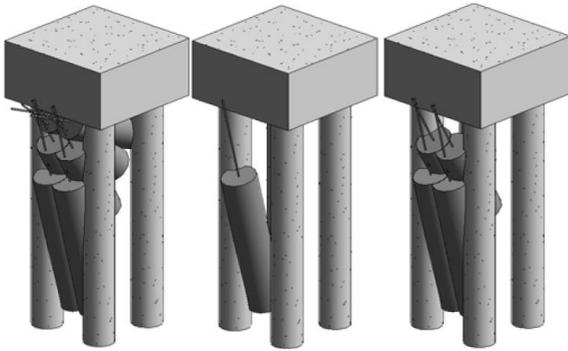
Indicative grouting stages at foundation locations as planned, TaM 1, 4 and 8 from left to right.
